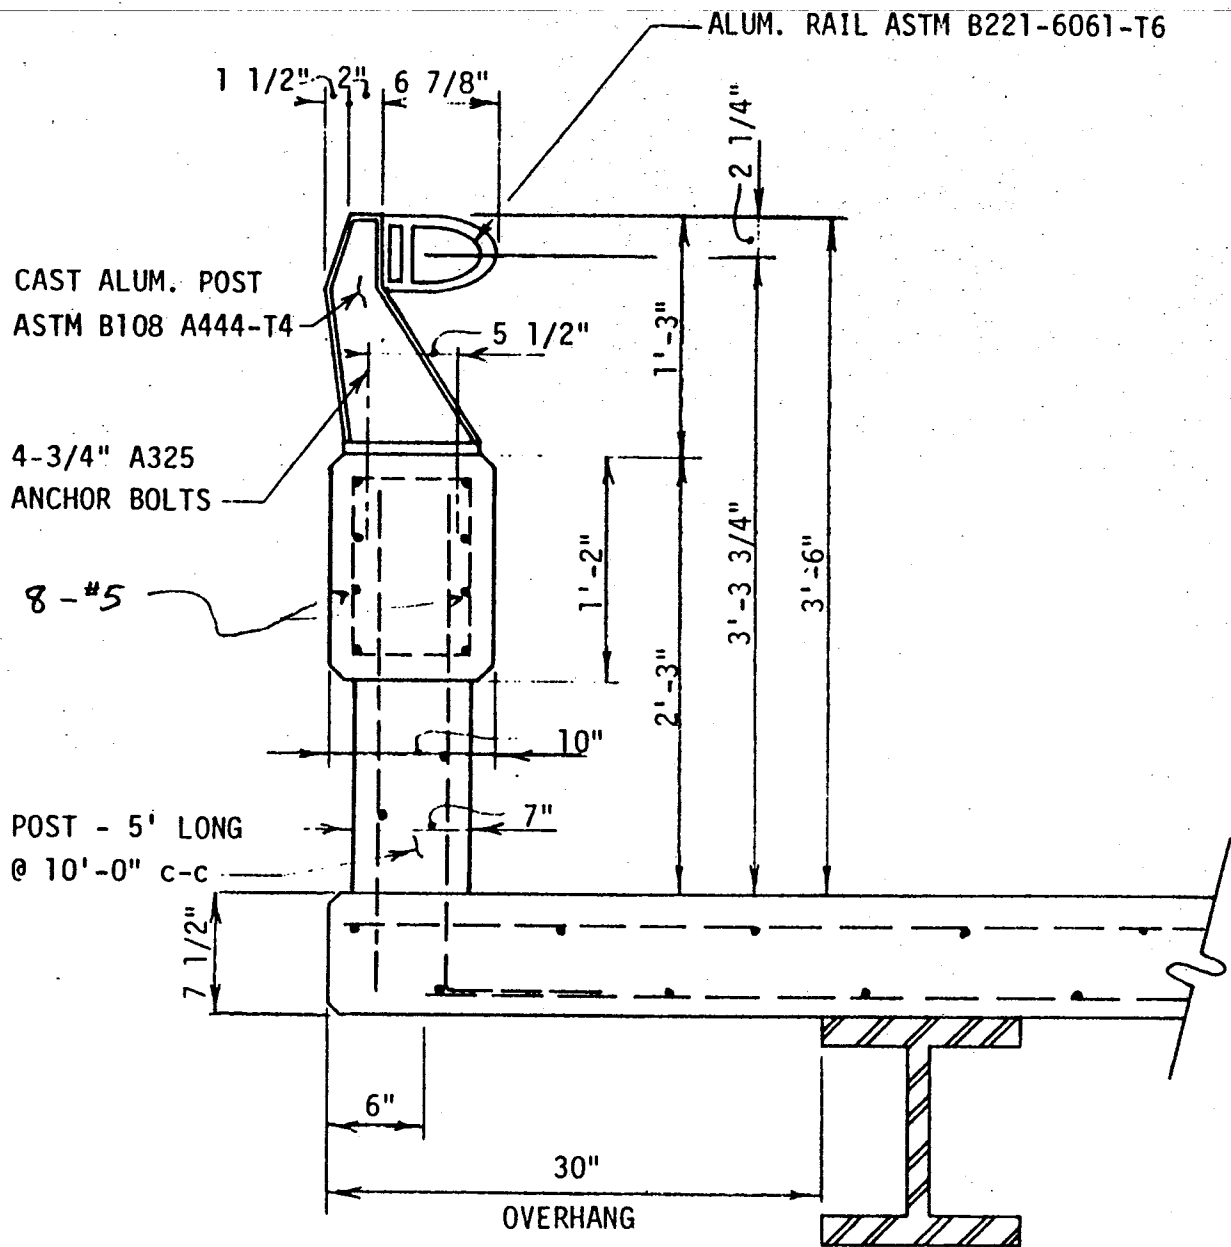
Cross Section of Modified T202 Bridge Rail used in Honda Test 2230-4.
